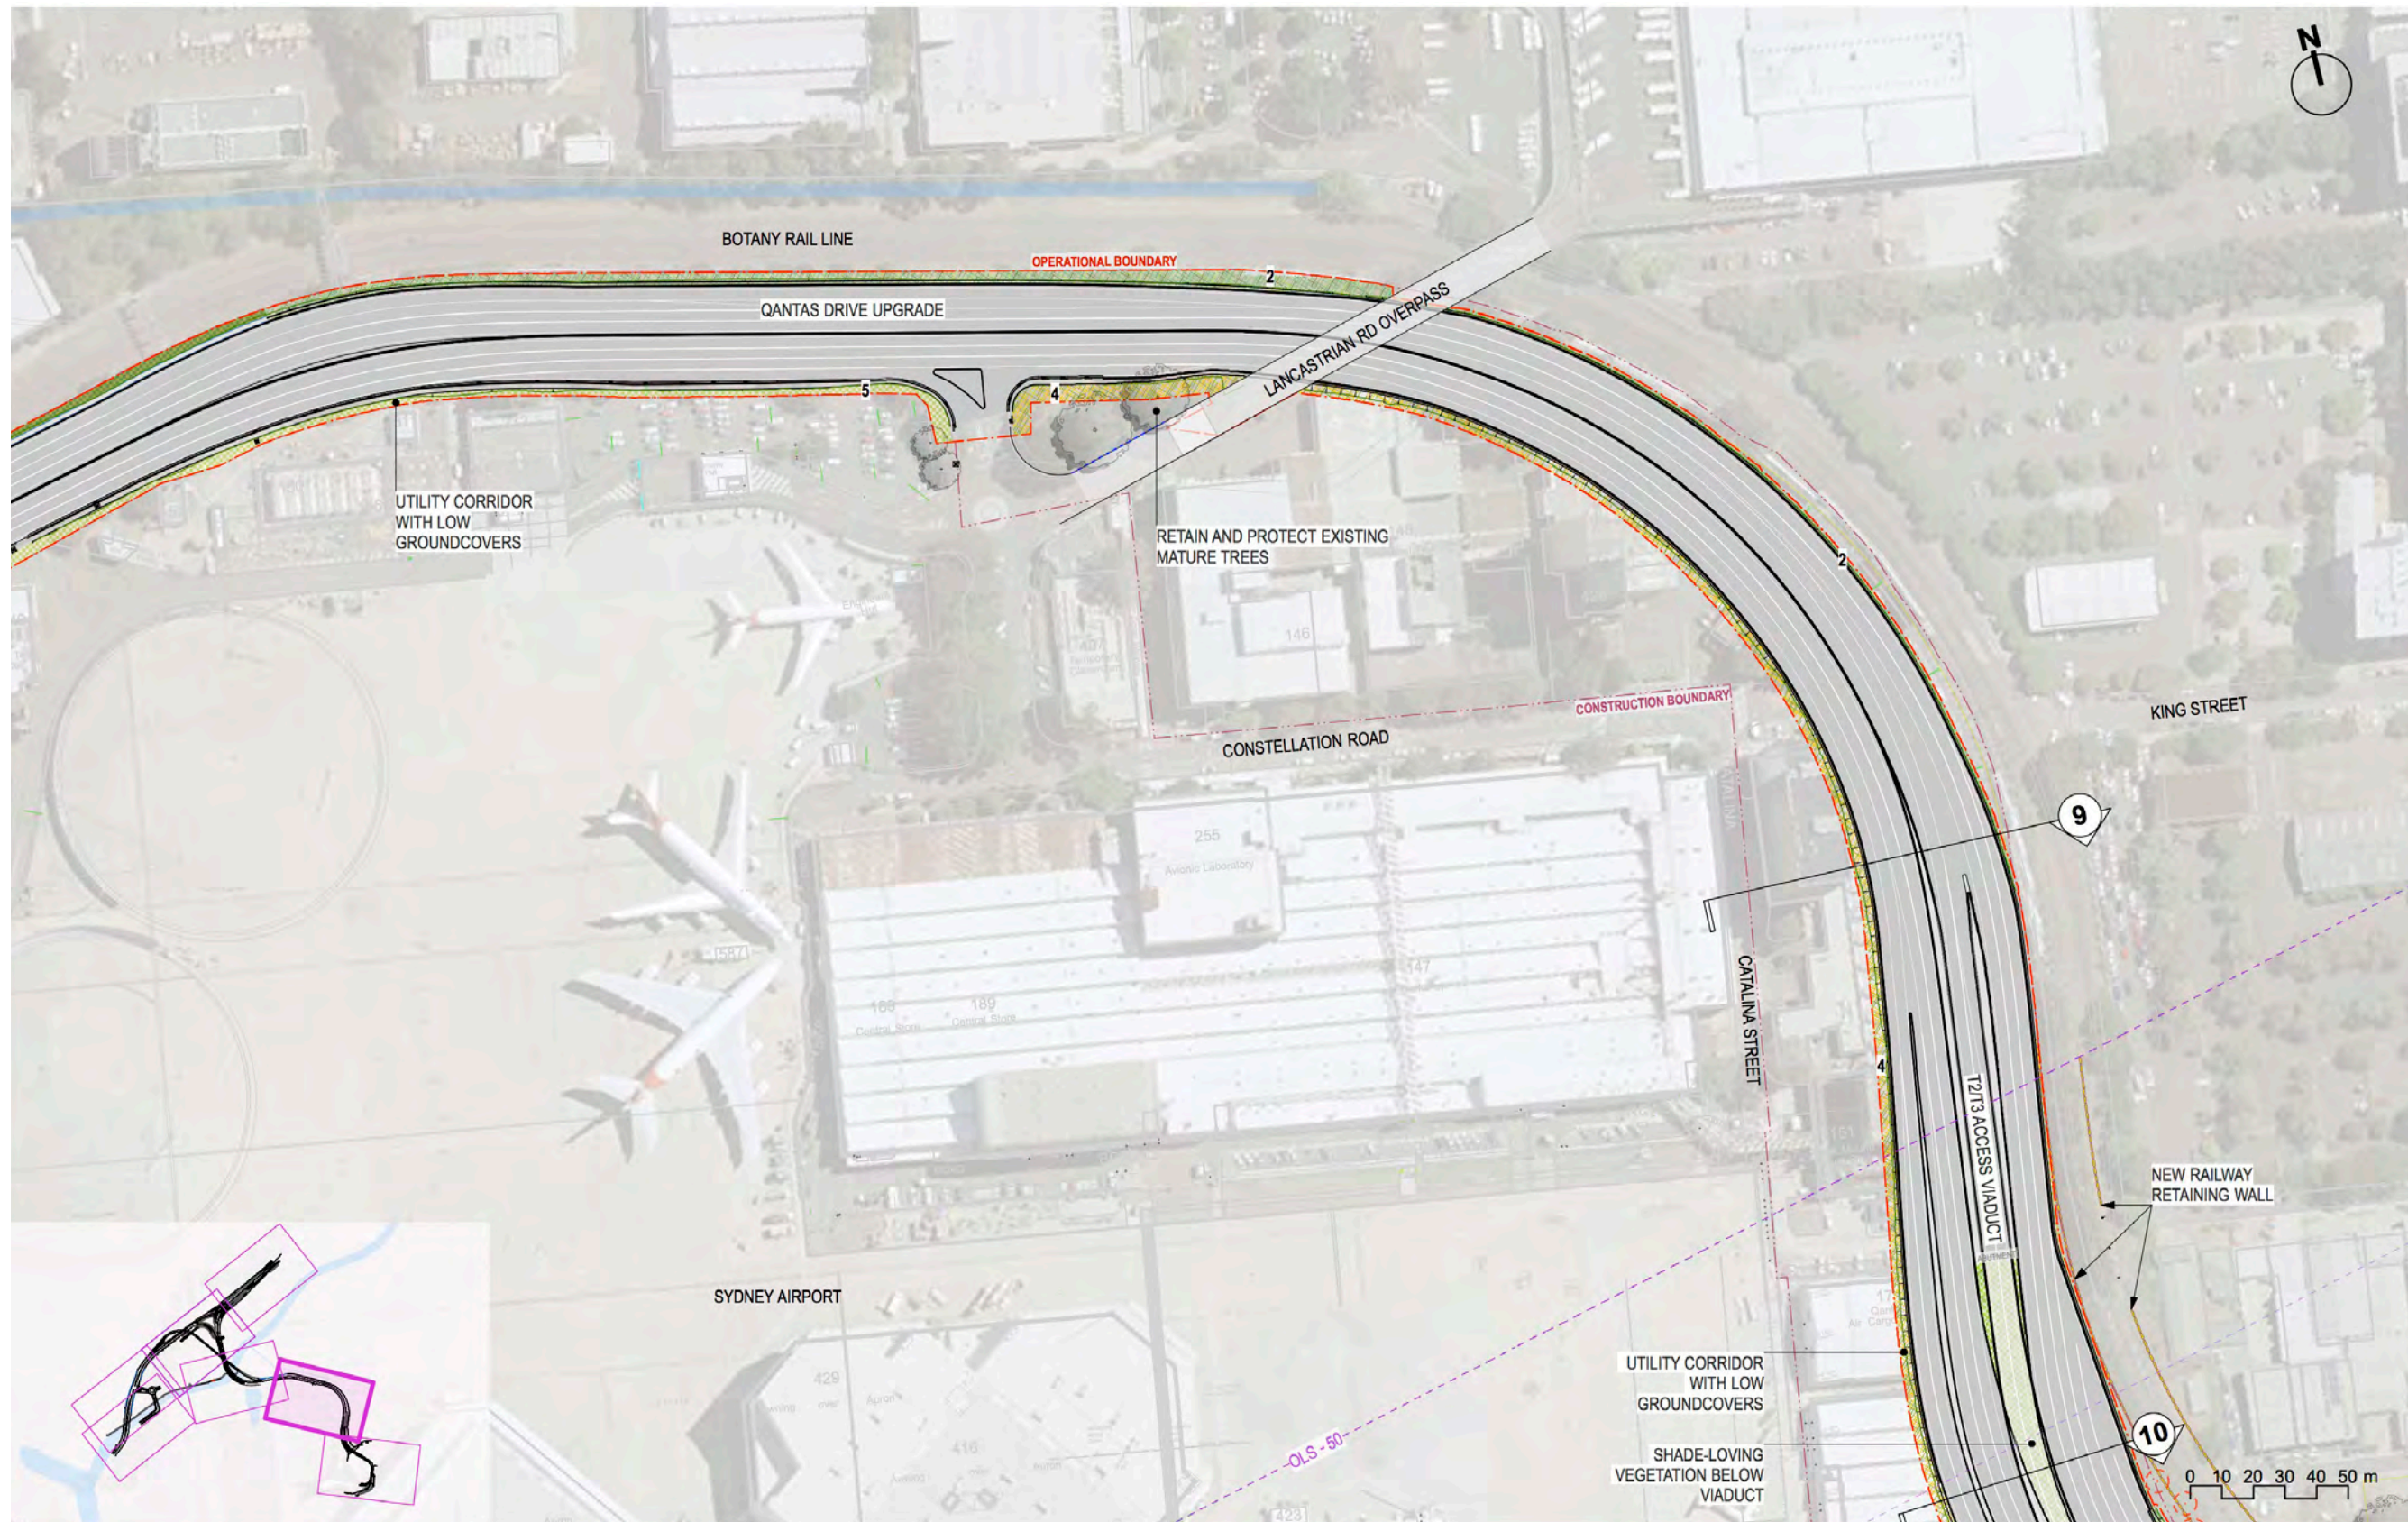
Urban and Landscape Design Concept plan - Precinct 6: Qantas Drive upgrade
